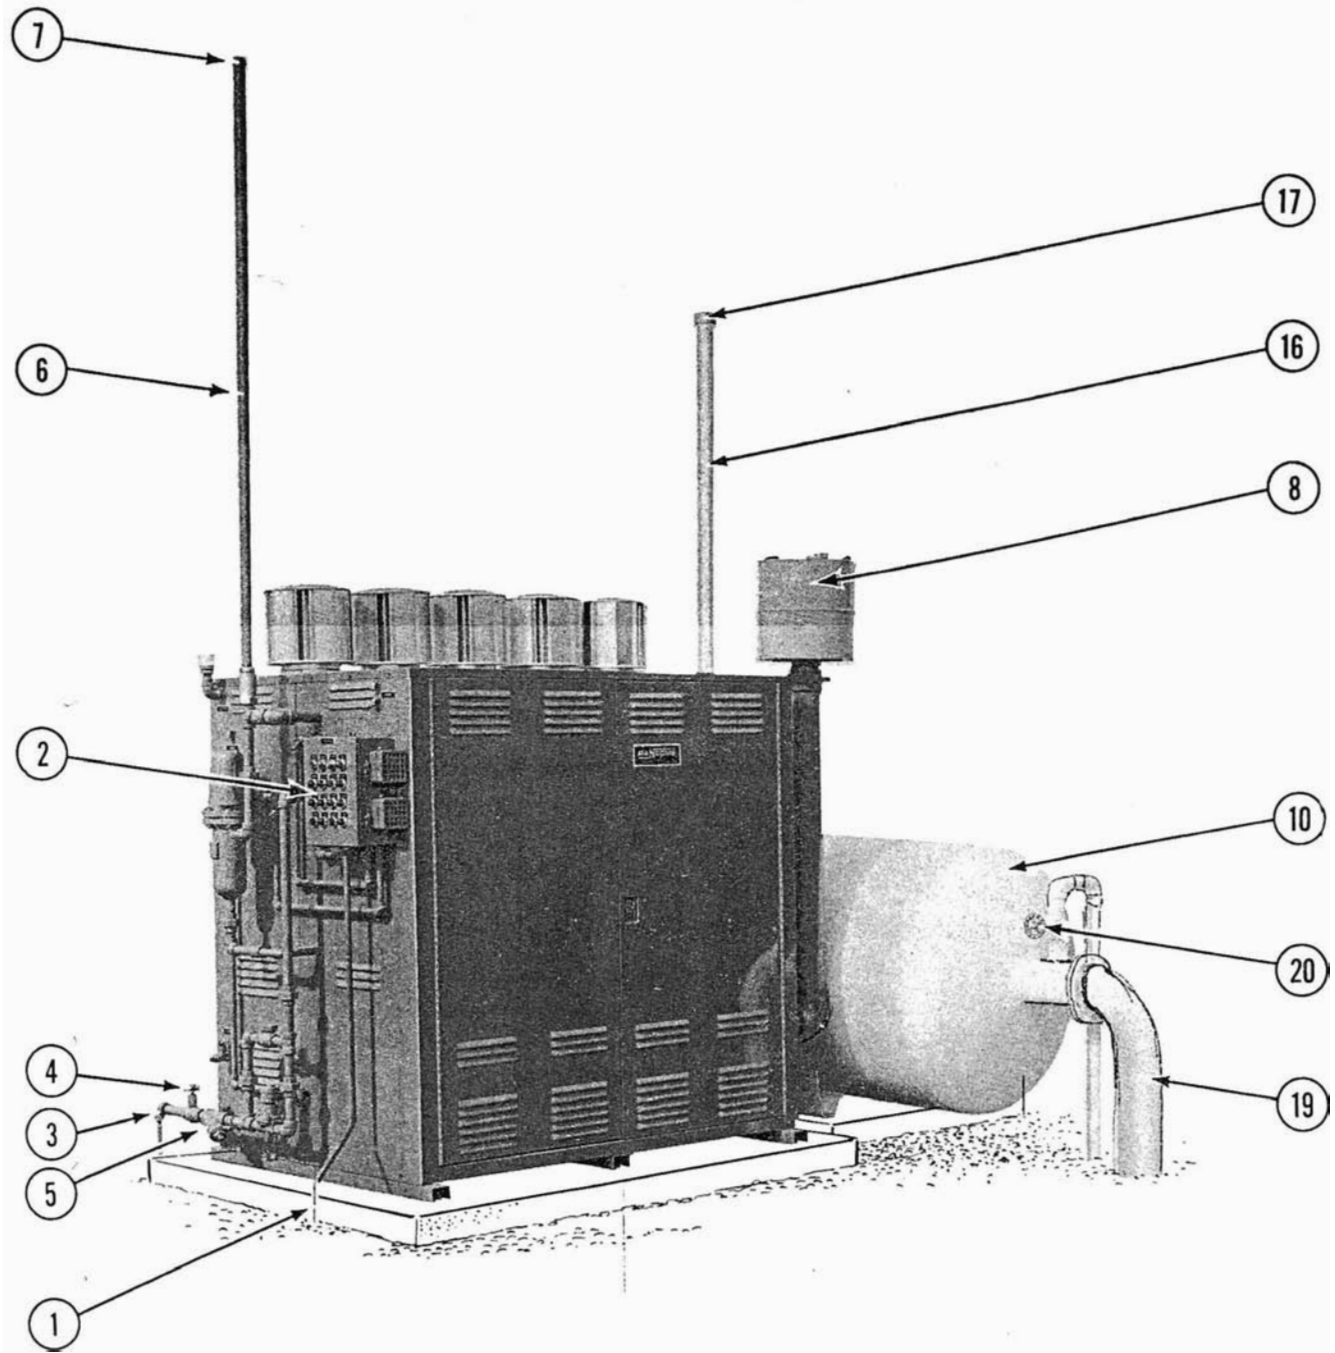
PAMW 900-50 Installation Typical for -10 to -50
